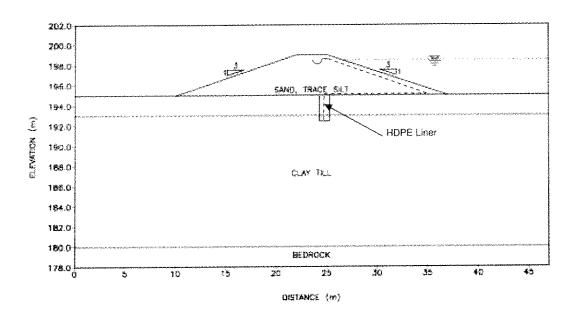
Proposed Layout of HDPE Liner (Option 1)
